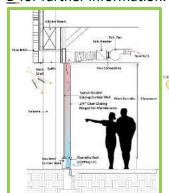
Ventilated Double Wall Façade(left) and Classroom/Corridor Daylight Section (top)
